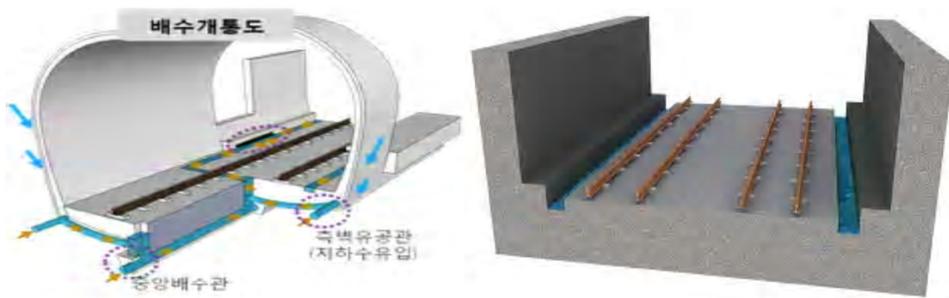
Drainage N.A.T.M. Tunnel & Drainage open cut Tunnel
